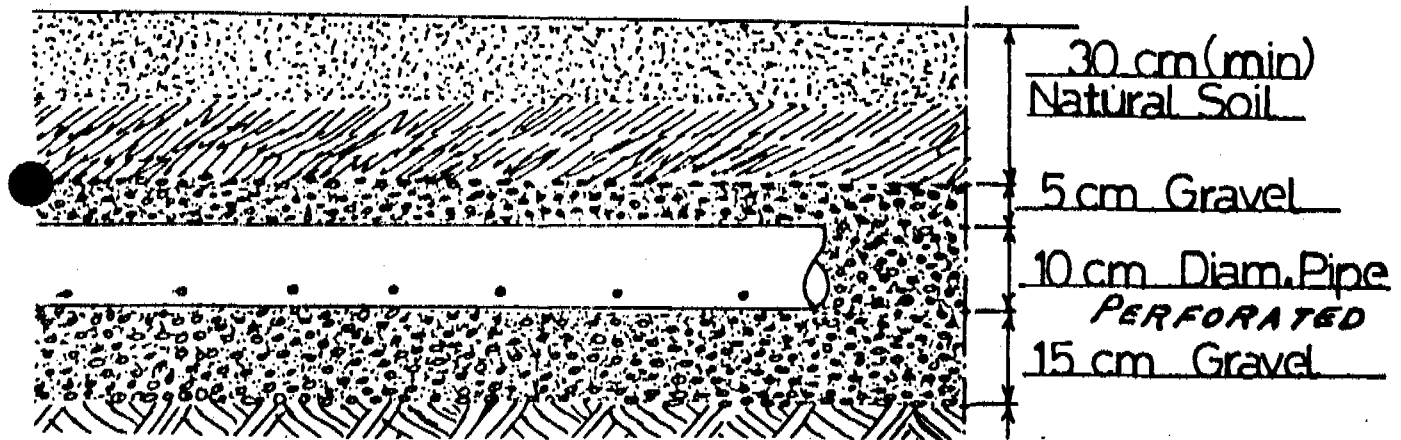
DETAILS OF THE DRAINAGE TRENCH
